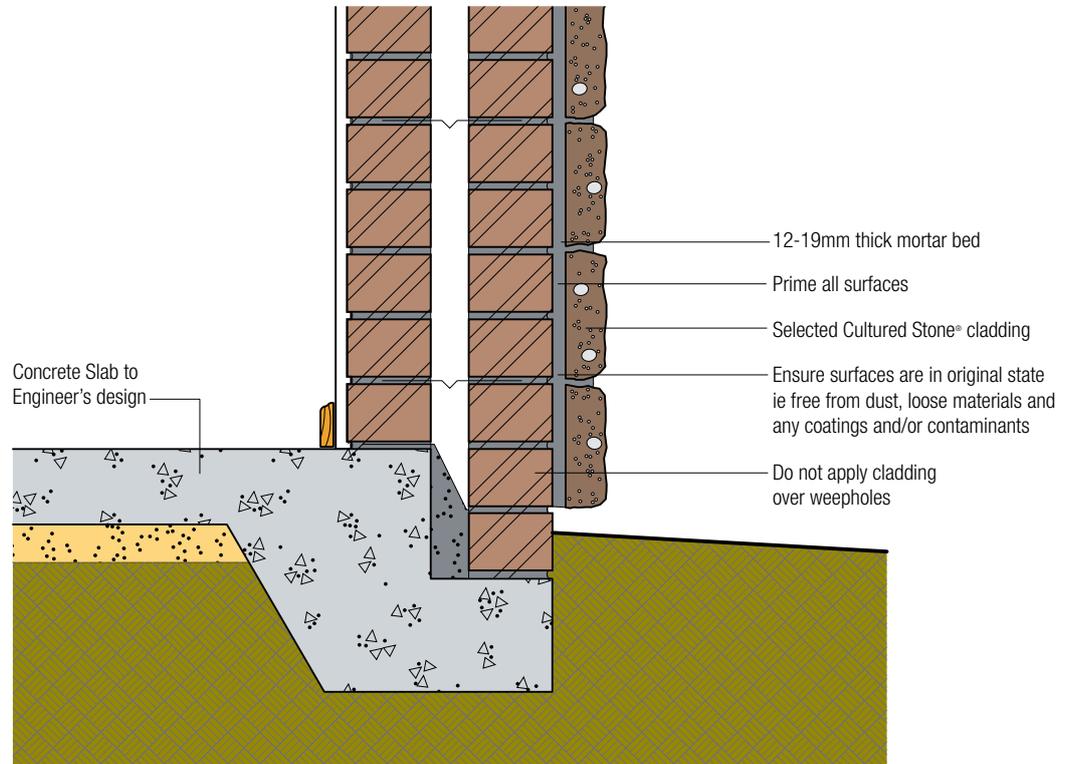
Brick or Block Work Base - Section (Dwg # CS-04.02)
